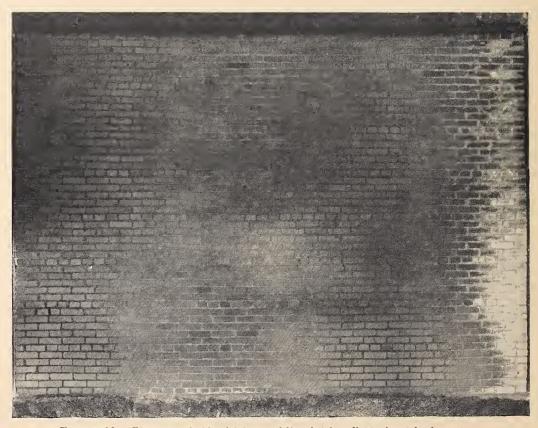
Fire-exposed side of 8-in. sand-lime brick wall 30 after 6-hr fire test.
